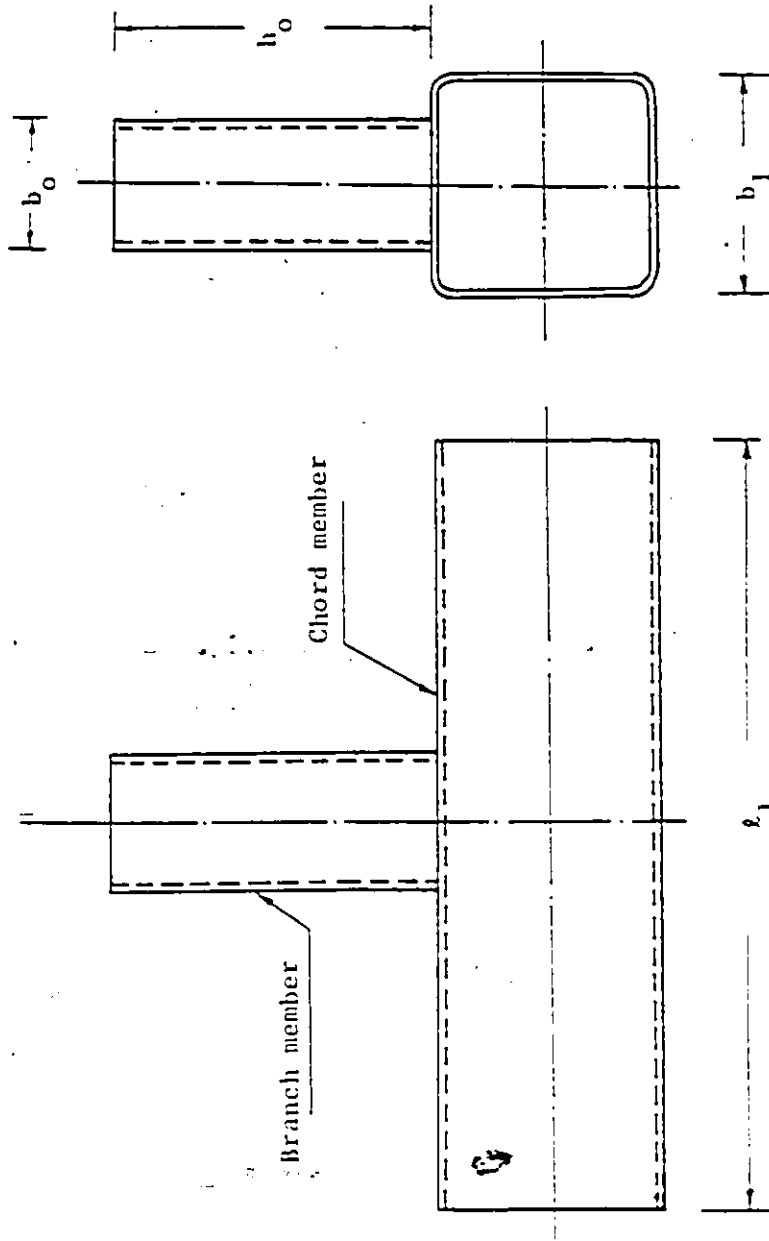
Sketch of Typical Unequal Width Hollow Section T-joint
